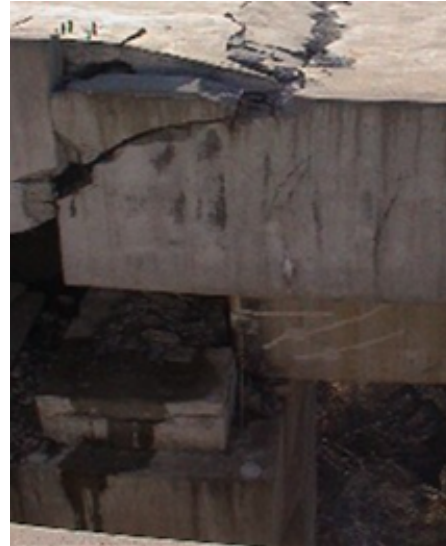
Beams, "hanging" out of the pier heads, creating a great challenge for the design of the lifting devices
